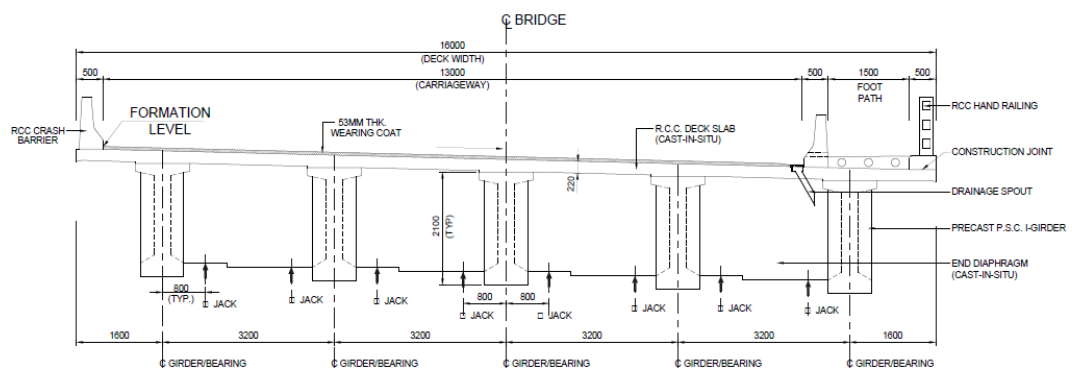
10 Cross section of 35m span OC post tensioned I girder at support
